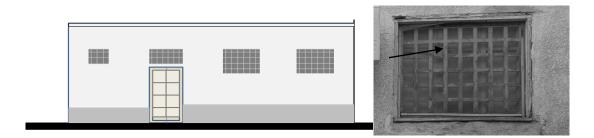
Security system; the external façade; the windows are higher than the level of pedestrians
